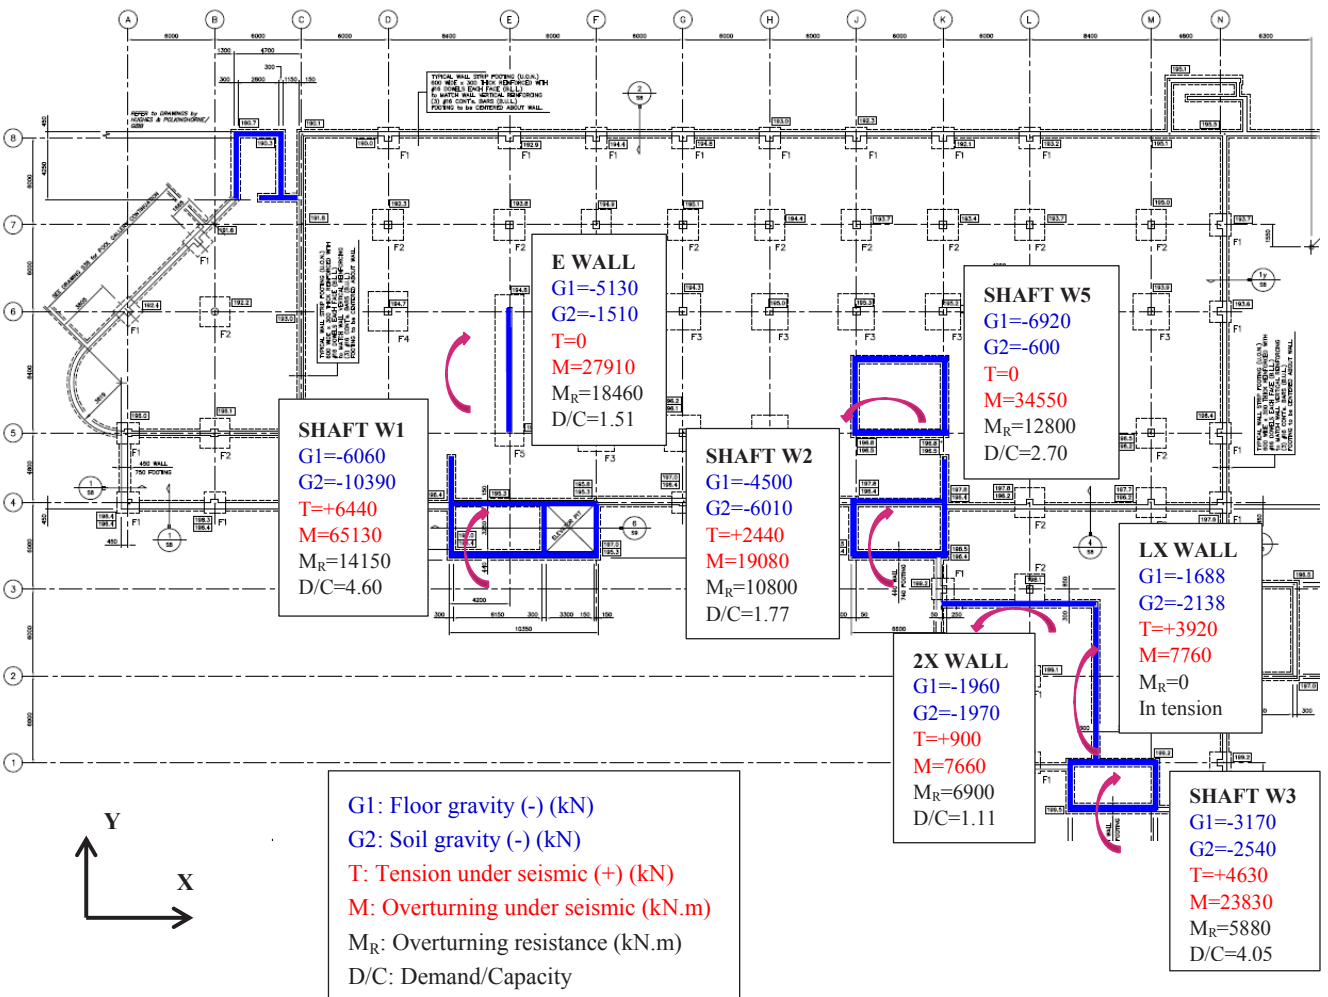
Walls and shafts overturning checking (Arup 100% loading)
